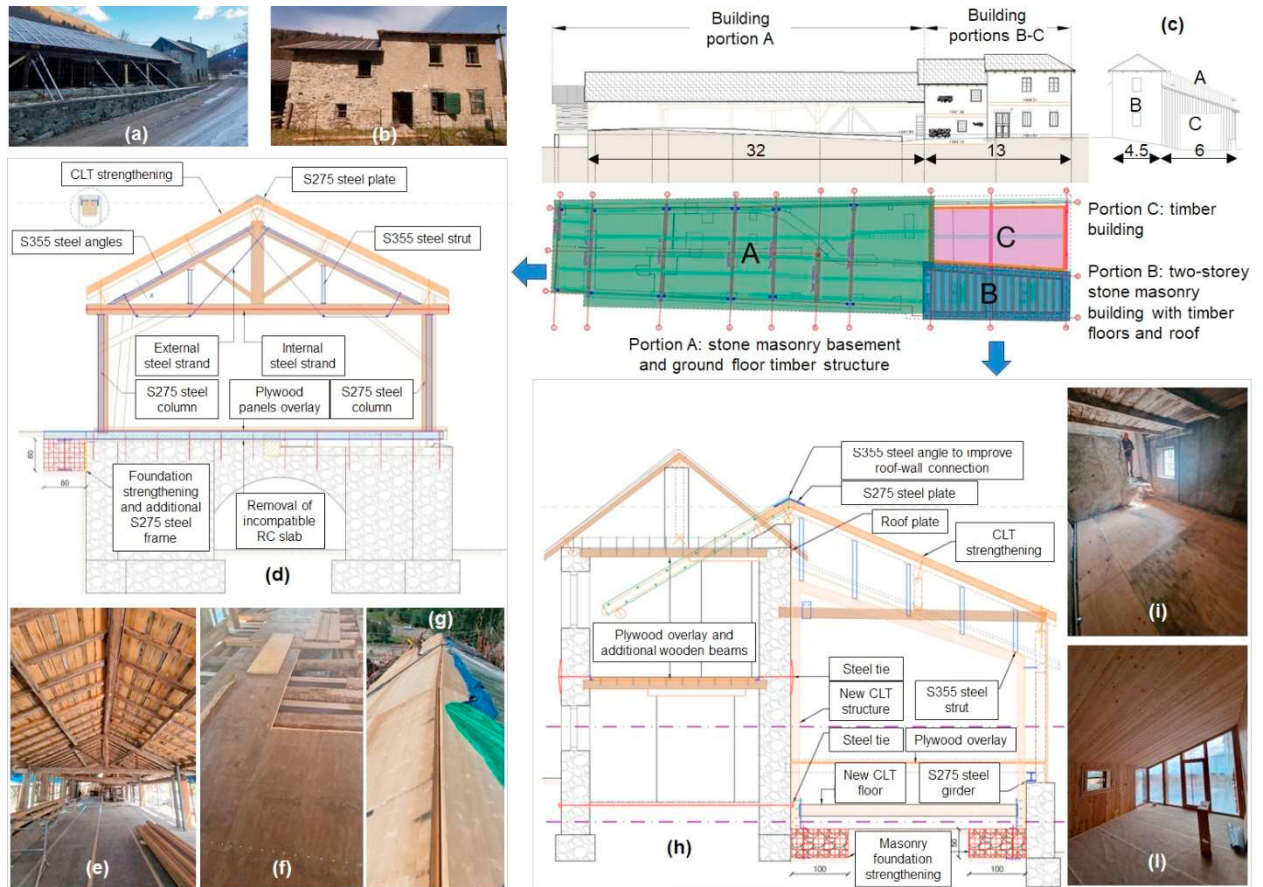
Third case-study building: views of the timber (a) and masonry (b) portions of the Venetian sawmill of Vallaro; plan and elevations (in m) of the building (c); main interventions applied to portion A (d), with pictures of plywood (e, f) and CLT (g) retrofitting of timber floors and roofs; main interventions applied to portions B-C (h), with pictures of plywood retrofitting of timber floors (i) and of the new CLT structure (l).
